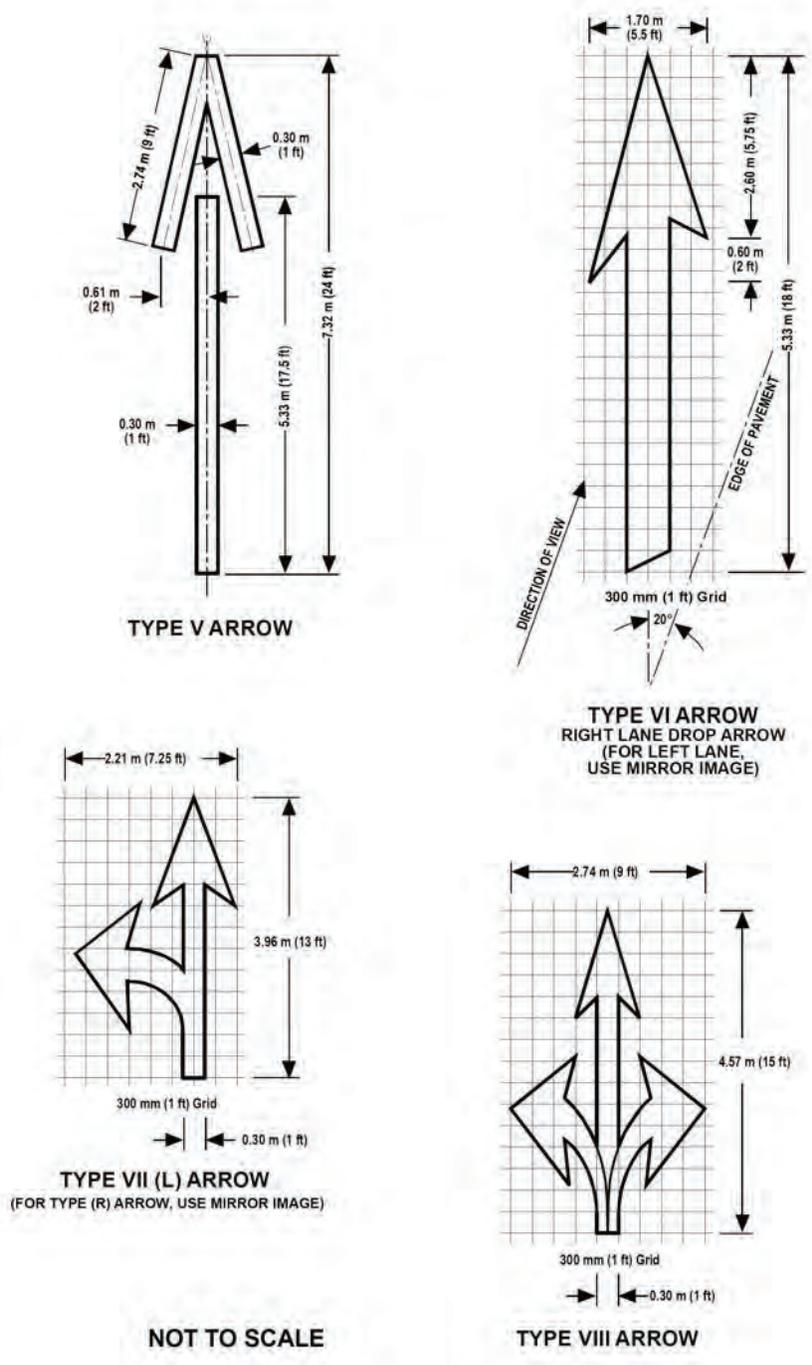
B-21 (CA). Examples of Arrows for Pavement Markings (Sheet 1 of 2)
